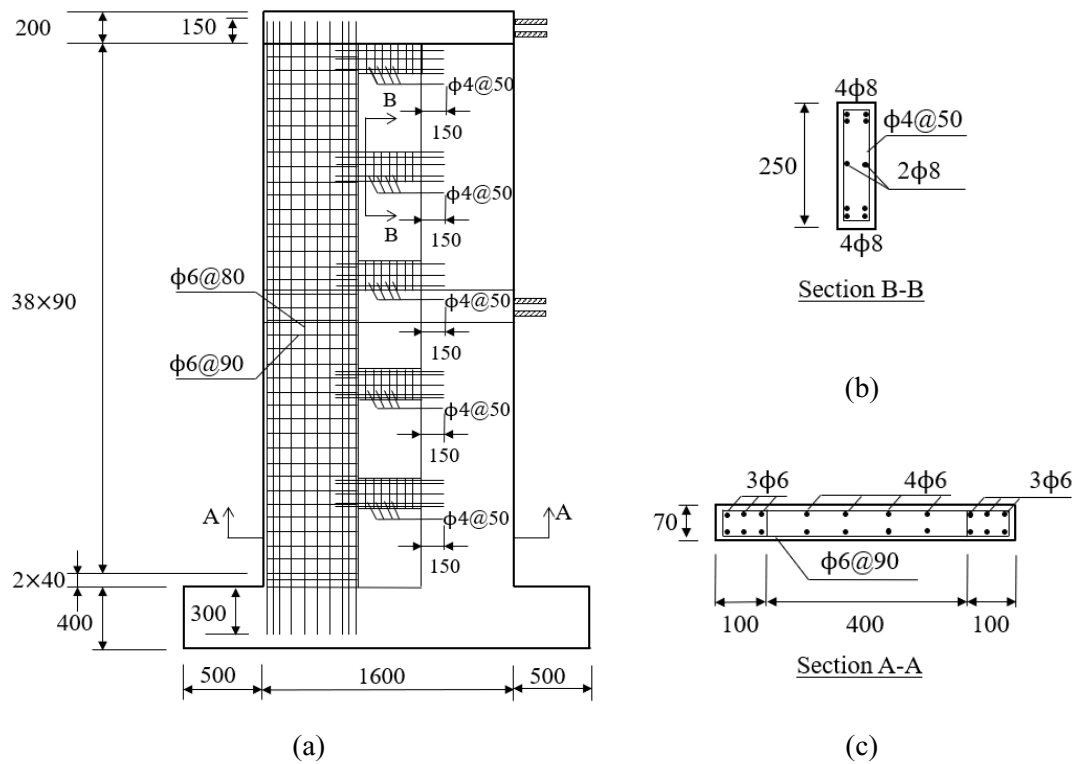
Schematic reinforcement details of the coupled wall specimen CW2: (a) elevation view; (b) wall piers; (c) coupling beam
